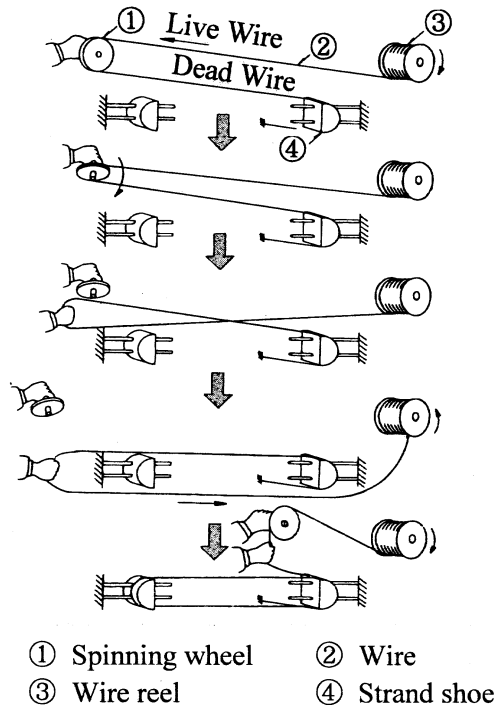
Operating principle of aerial spinning. (Source: Honshu–Shikoku Bridge Authority, Technology of Seto–Ohashi Bridge, Japan, 1989. With permission.)
